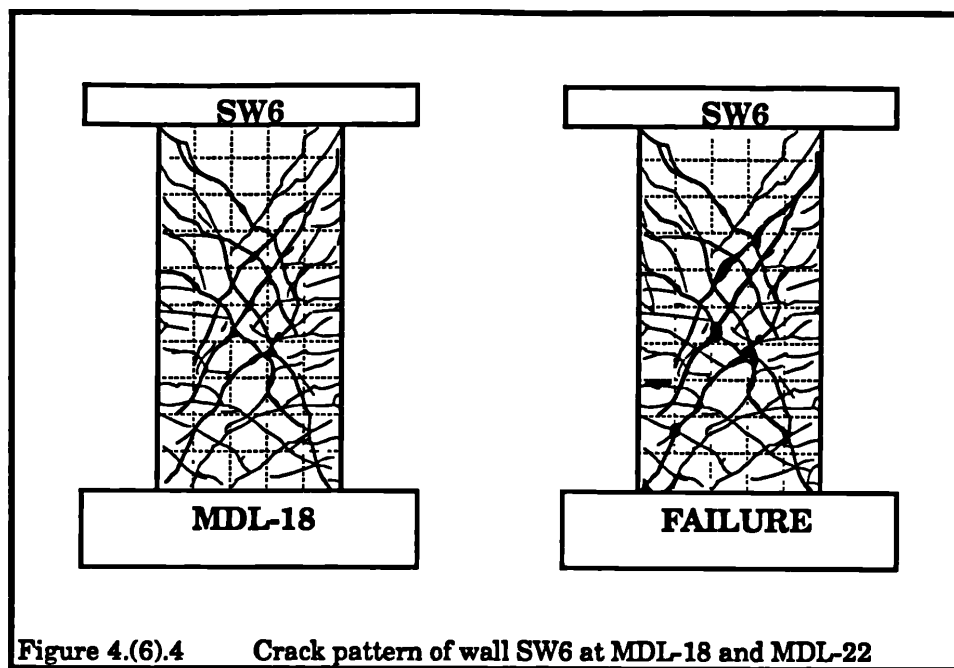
PilaSW6: DS4q - cracks at MDL-18 (open stirrup) and Failure
